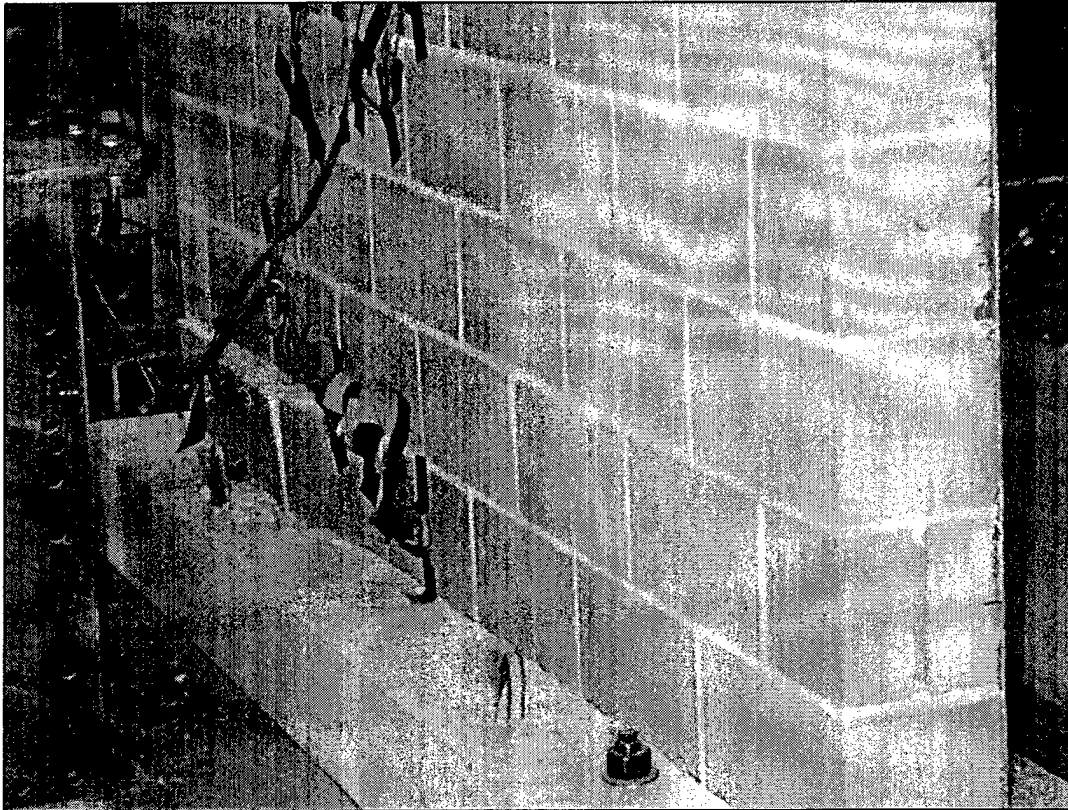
Out-of-plane facial slippage of bottom course CMU, inside of the north wall.
